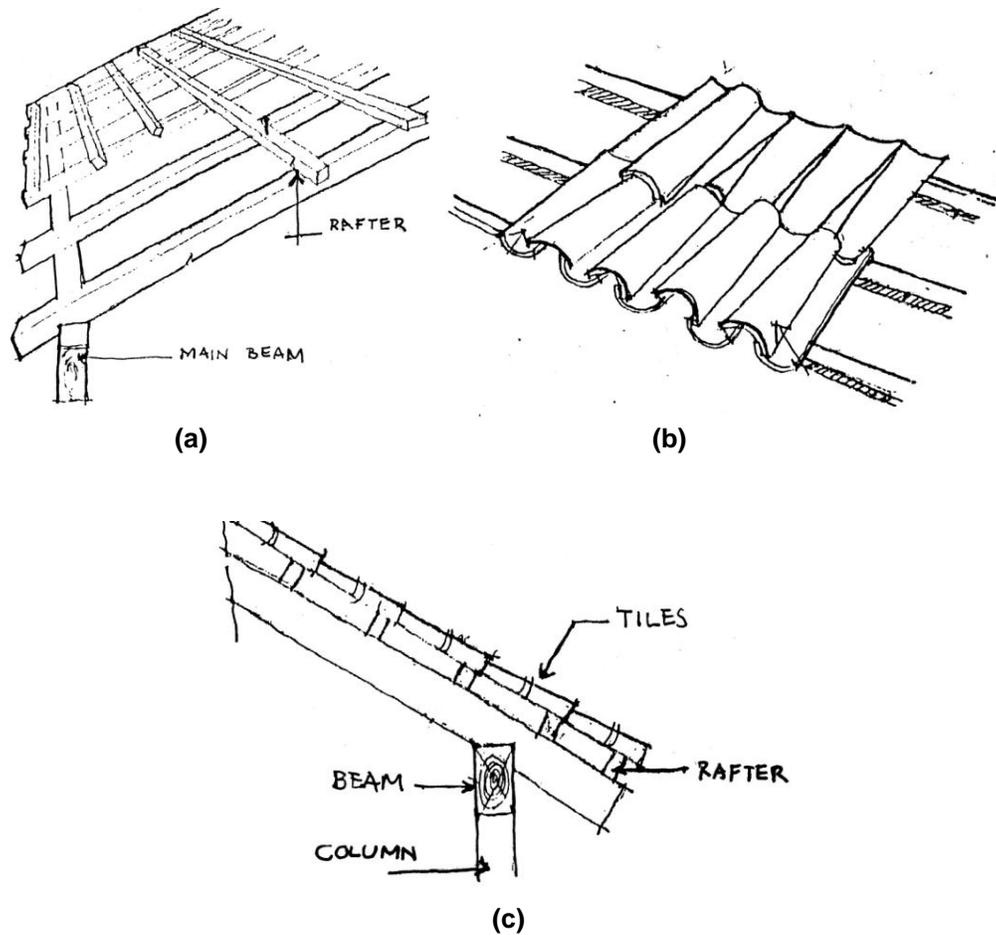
(a) Wooden grid where tiles are placed, top left. (b) position of tiles on the grid, top right. (c) lateral detail of tile position on the grid, bottom (Moisa y Medrano [10]).
